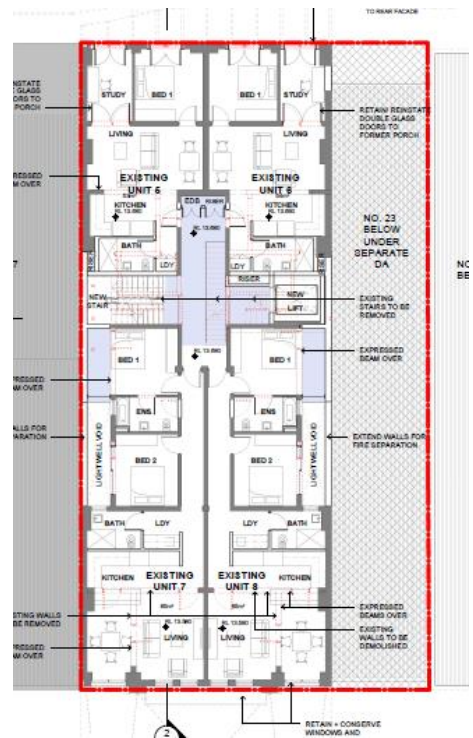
Proposed Second Floor Plan. (Source: NBRSEARCHITECTURE)
